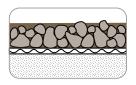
Impermeable revetment system with the use of a nonwoven separation geotextile
